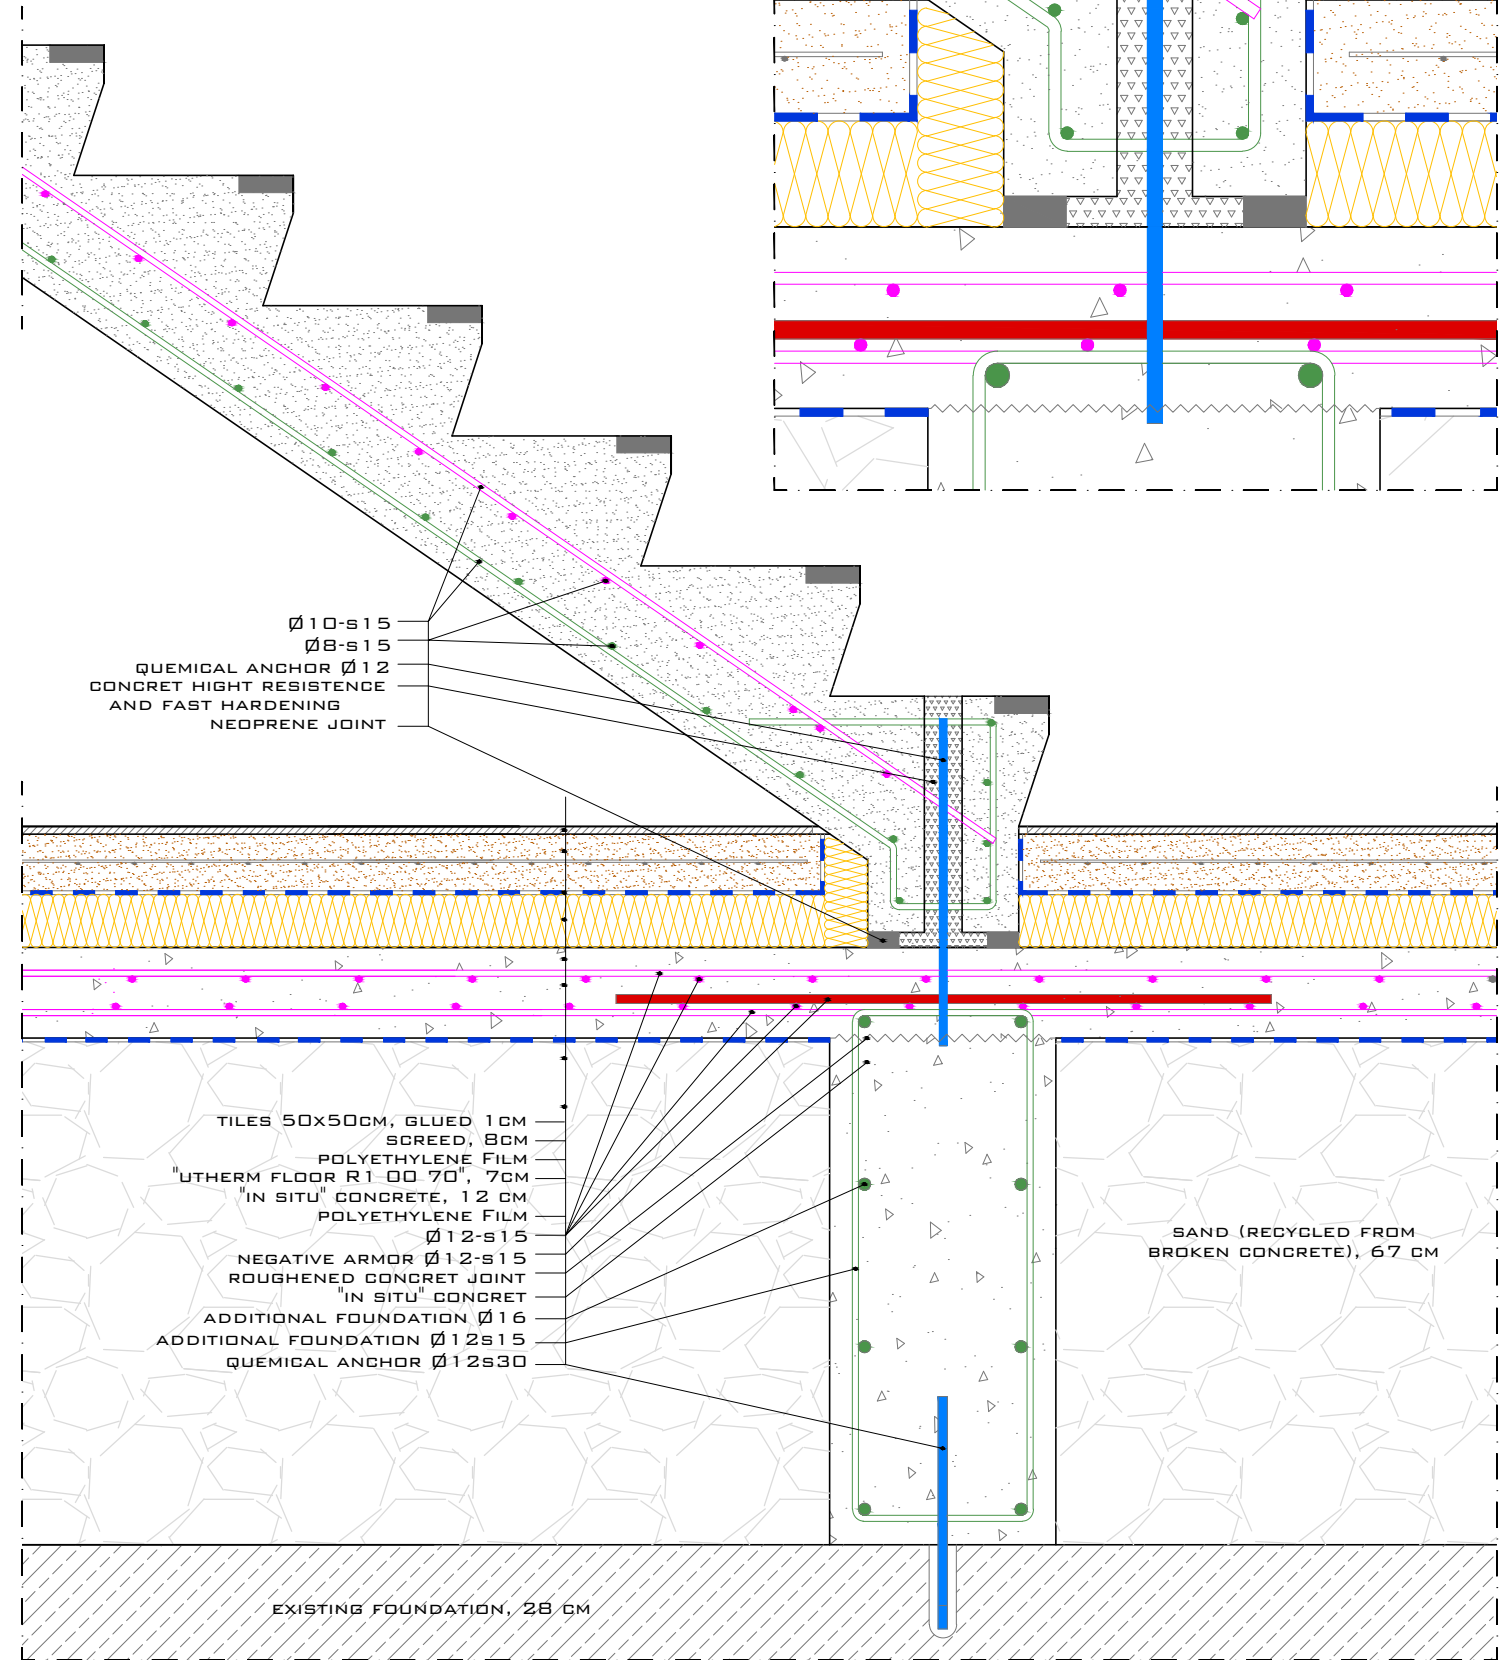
PREFABRICATED STAIR \_ S:1/25
